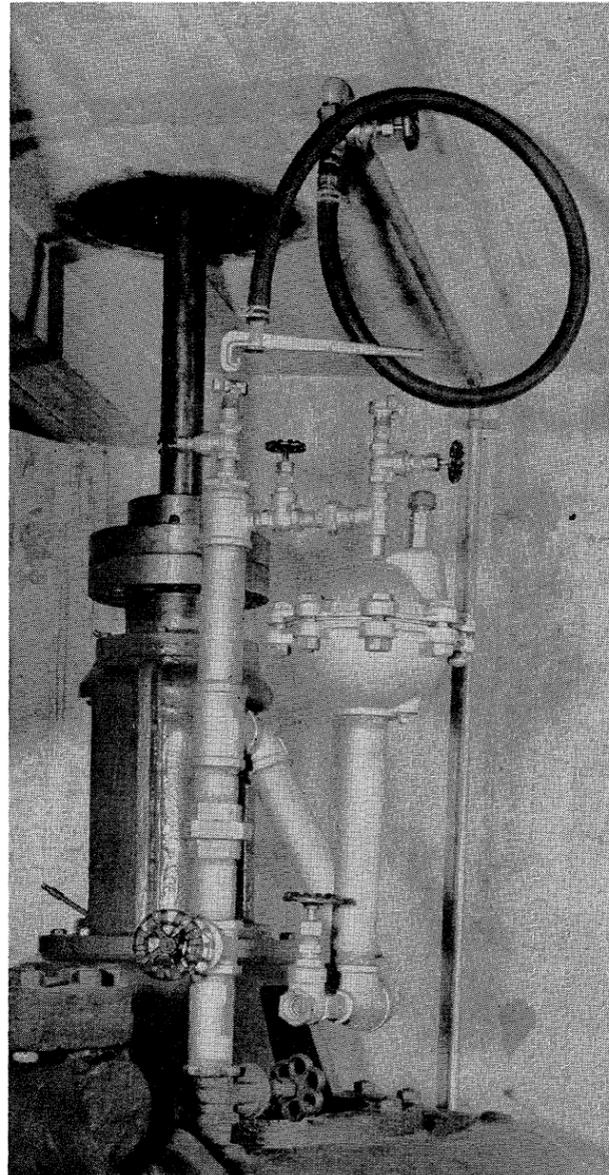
Sewage Type Air Release Valve Mounted on Suction of Wet Well Pump.
